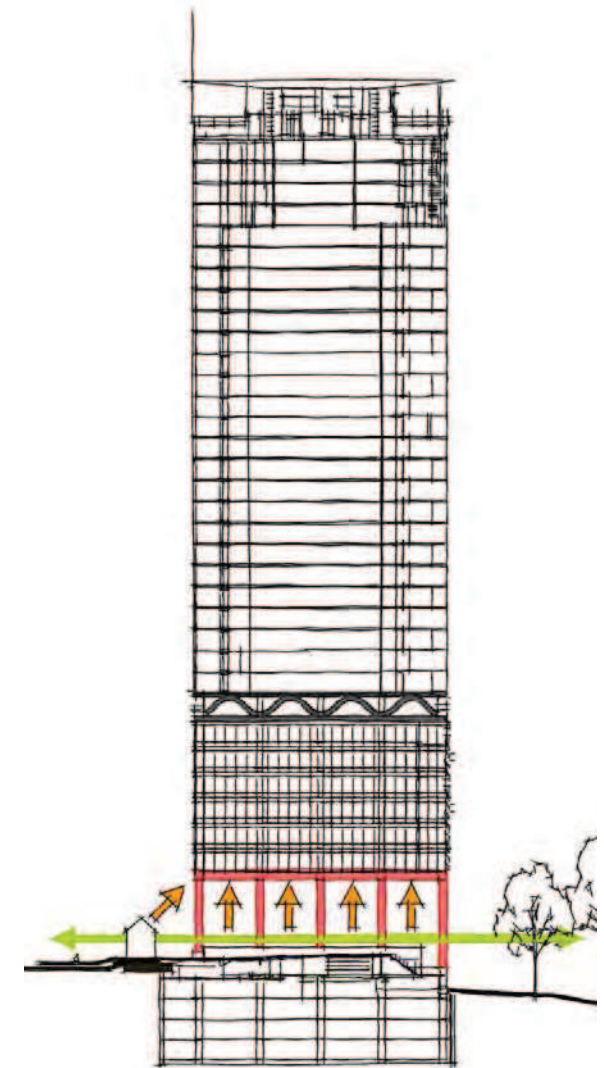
Open ground floor portico and setback of building mass to heritage item (Source - JSA Studio)
